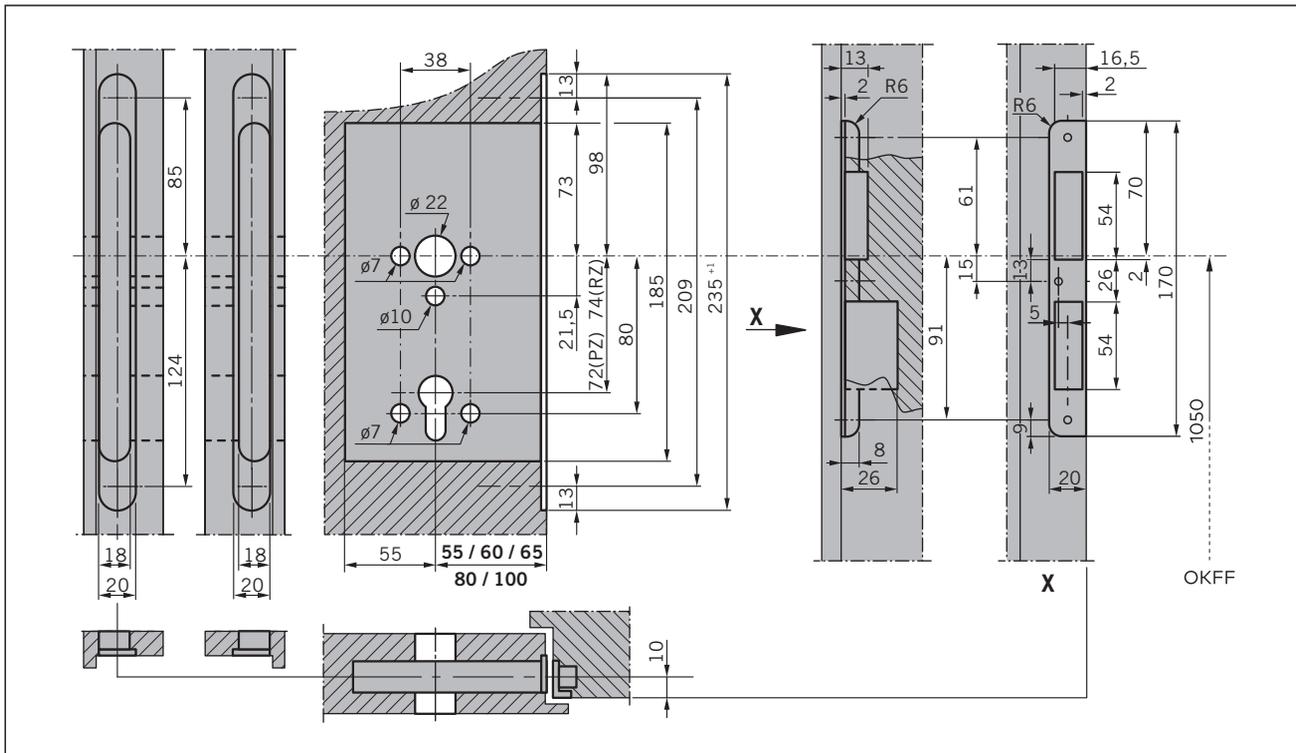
Cut-outs and pre-drilled holes in the door leaf and door frame with an angled striking plate
